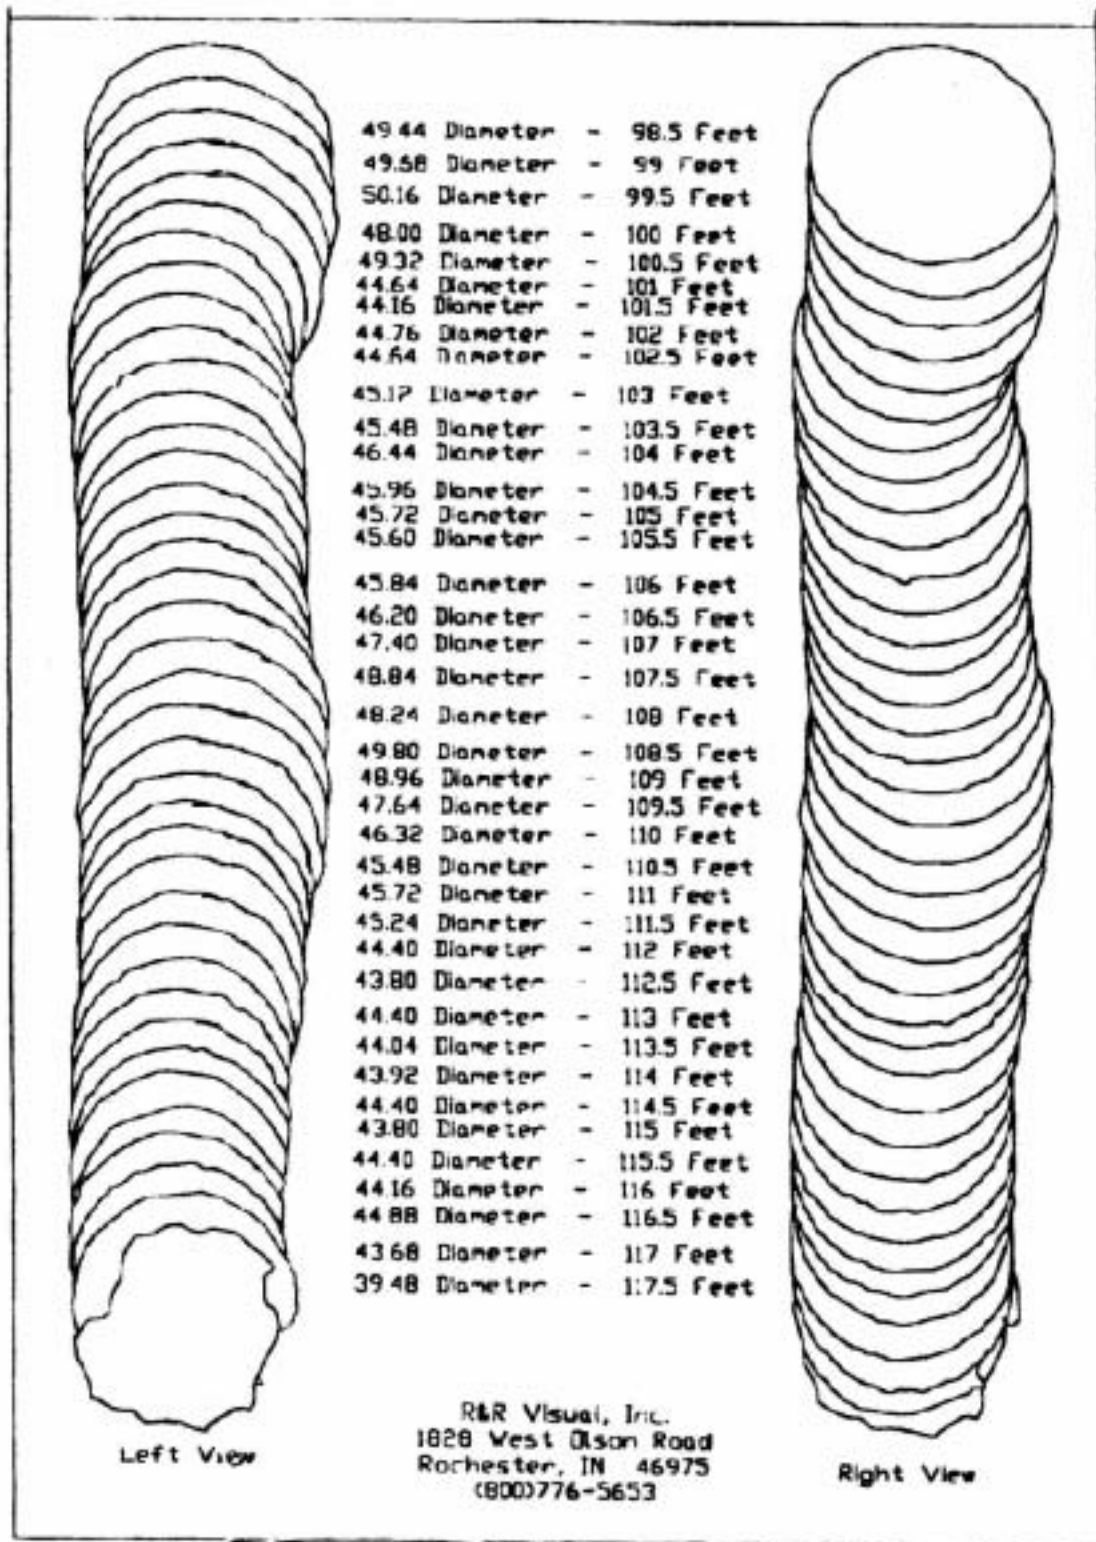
Sonar caliper log of rock socket for test shaft TS-2 (98.5-117.5 ft from top of casing).
